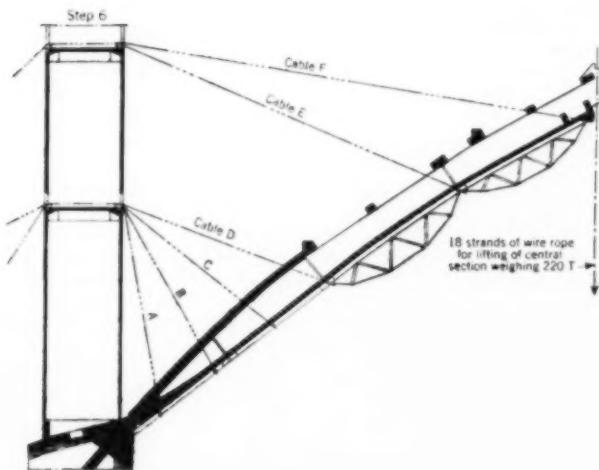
Erection of falsework and concreting of arch ribs was accomplished in seven steps. Concrete placed during each step is shown in heavy black. In Step 6, sides and cross pieces on top have been poured, but not main part of top. Raising of center section of falsework and completion of arch rib on it was Step 7 (see Fig. 1).
